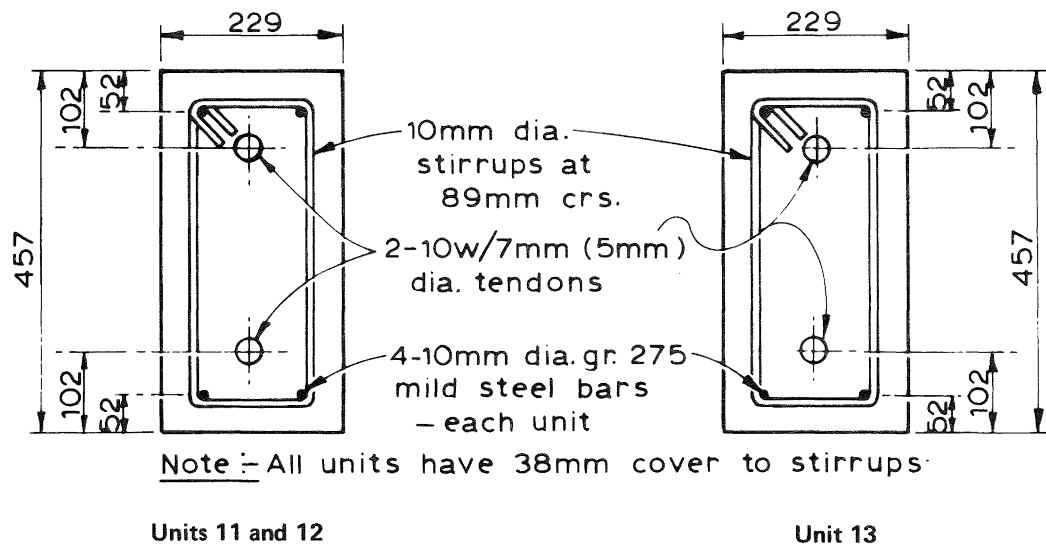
BEAM SECTIONS OF TEST UNITS
